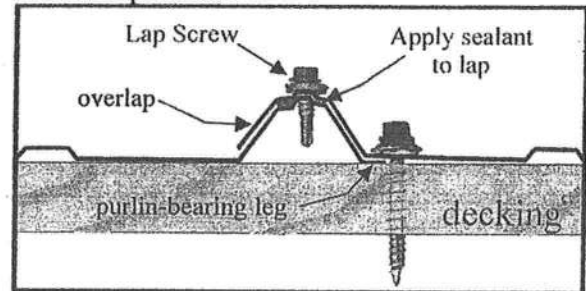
On low-pitched roofs butyl tape or caulk should be applied at the panel lap to keep water from overflowing the lap. Note that the *underlap* side of the panel has a short purlin-bearing leg that rests on the roof decking.
